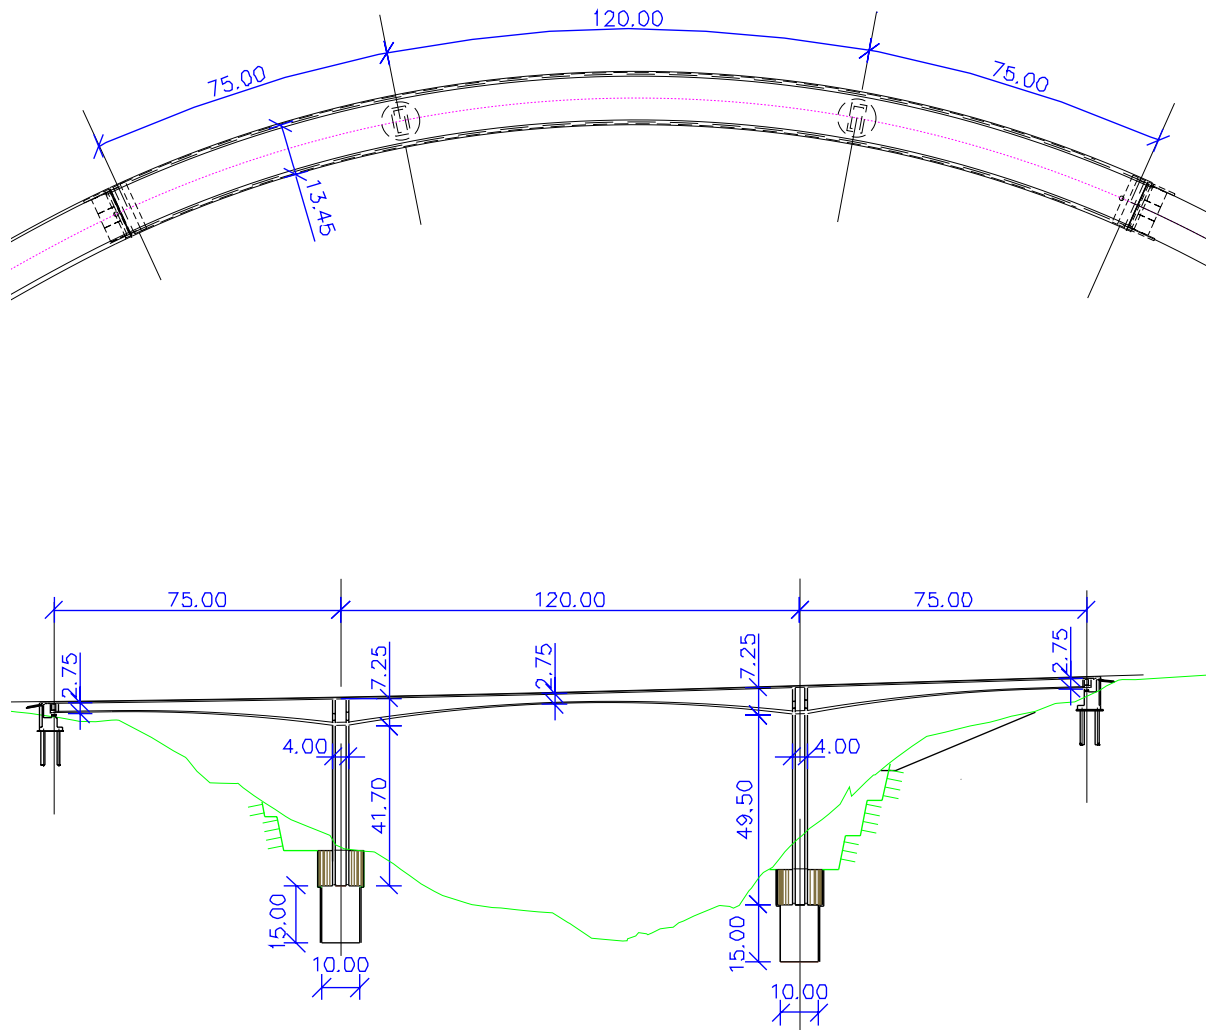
Plan and longitudinal-section of the bridge (all dimensions in meters).
